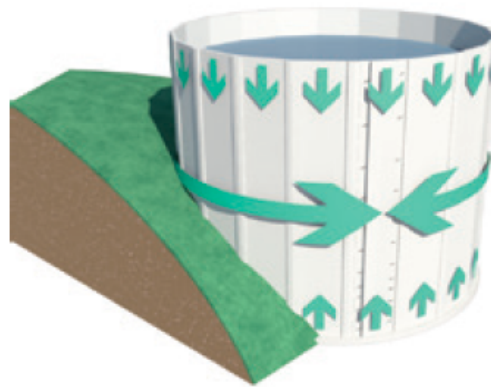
The structural effects arising when prestressing a precast concrete tank in both directions, Abetong (2015).
